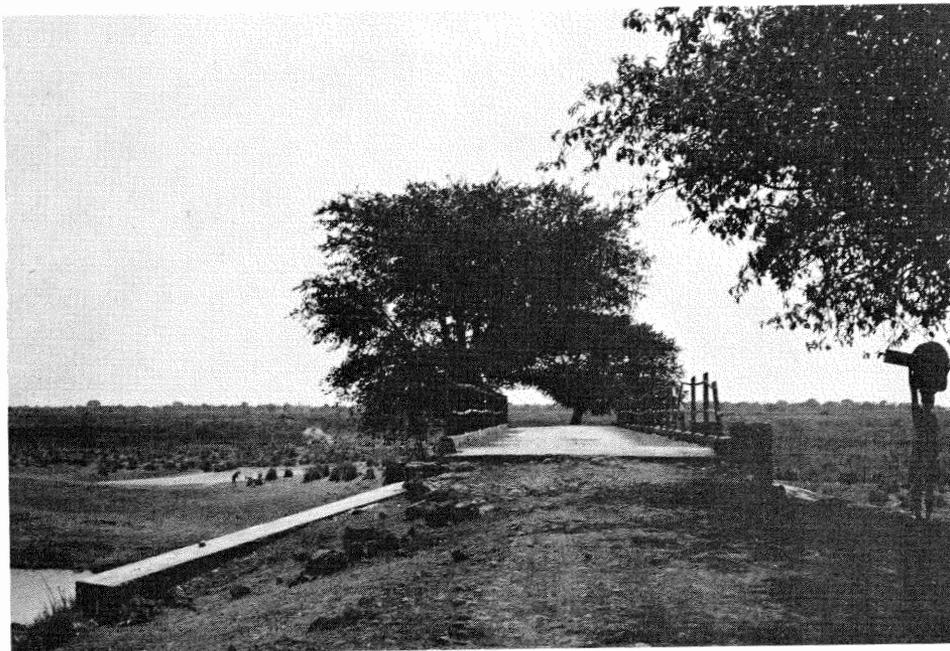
Bridge handrail damage on Rumbek-Tonj Road
